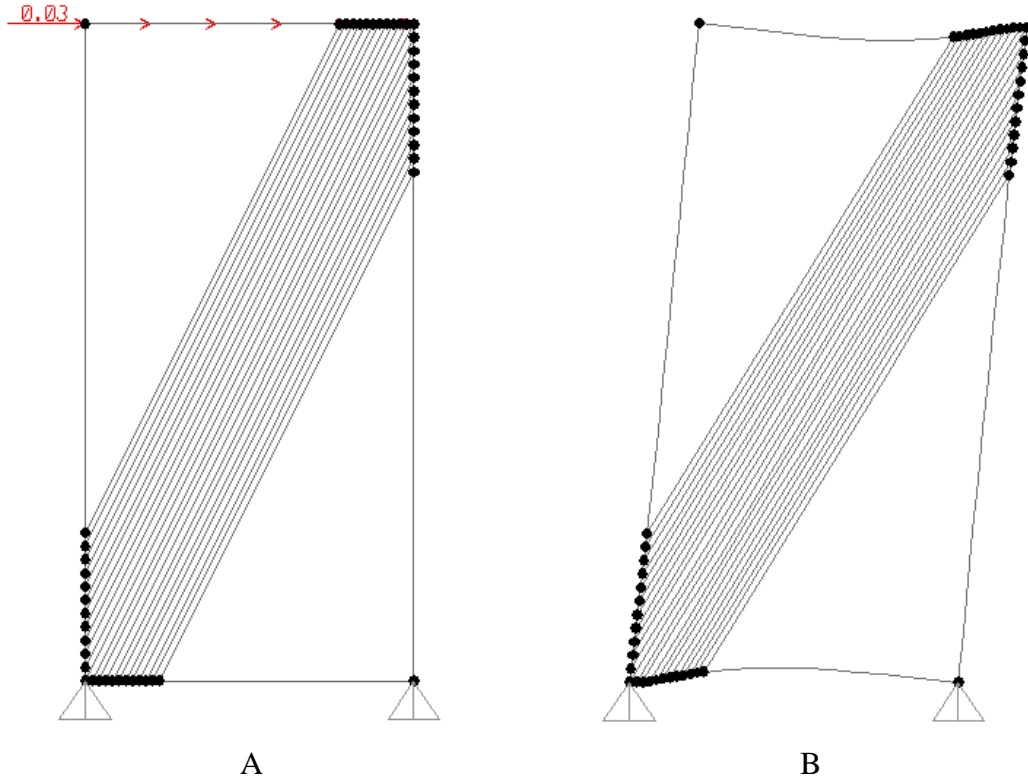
SAP2000© shear wall model analysis. A) Top of the wall subjected to V_n in kN/m. B) Shear wall deflected shape.
